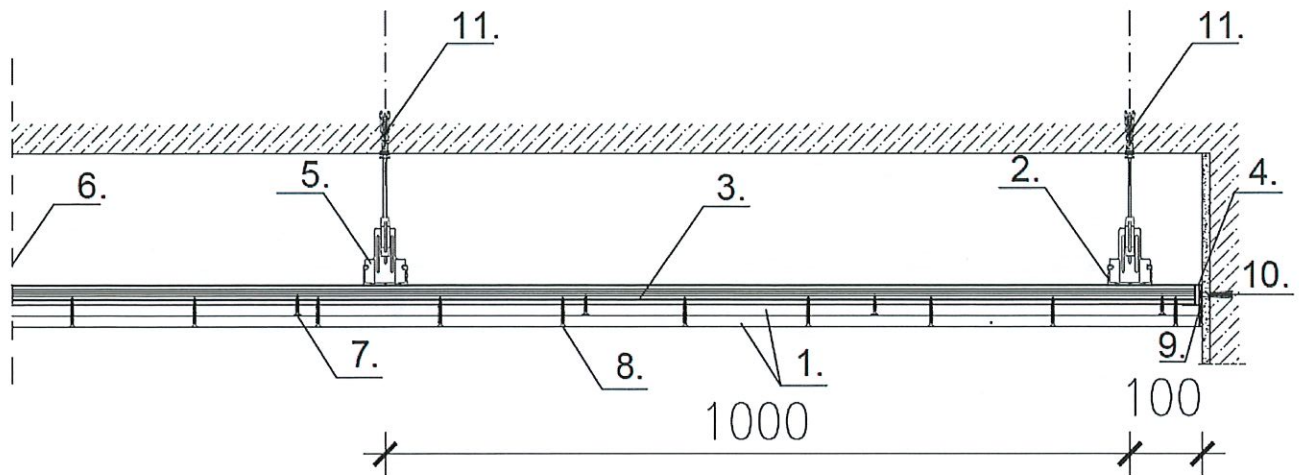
View of the suspended ceiling – two level cross construction with hangers ES 60 or ES 60 plus
